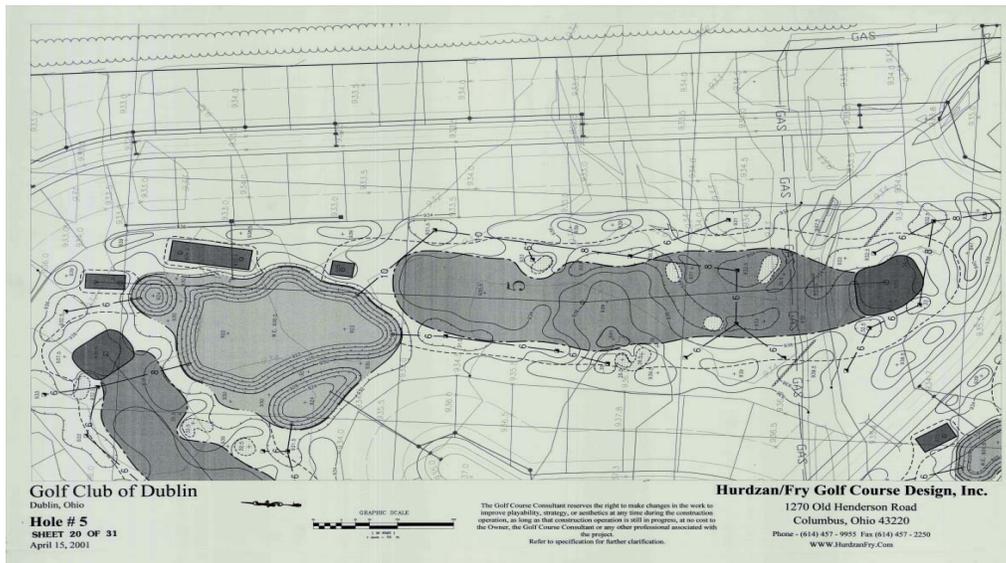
Original plan for Hole #5 at Golf Club of Dublin as a par 4
